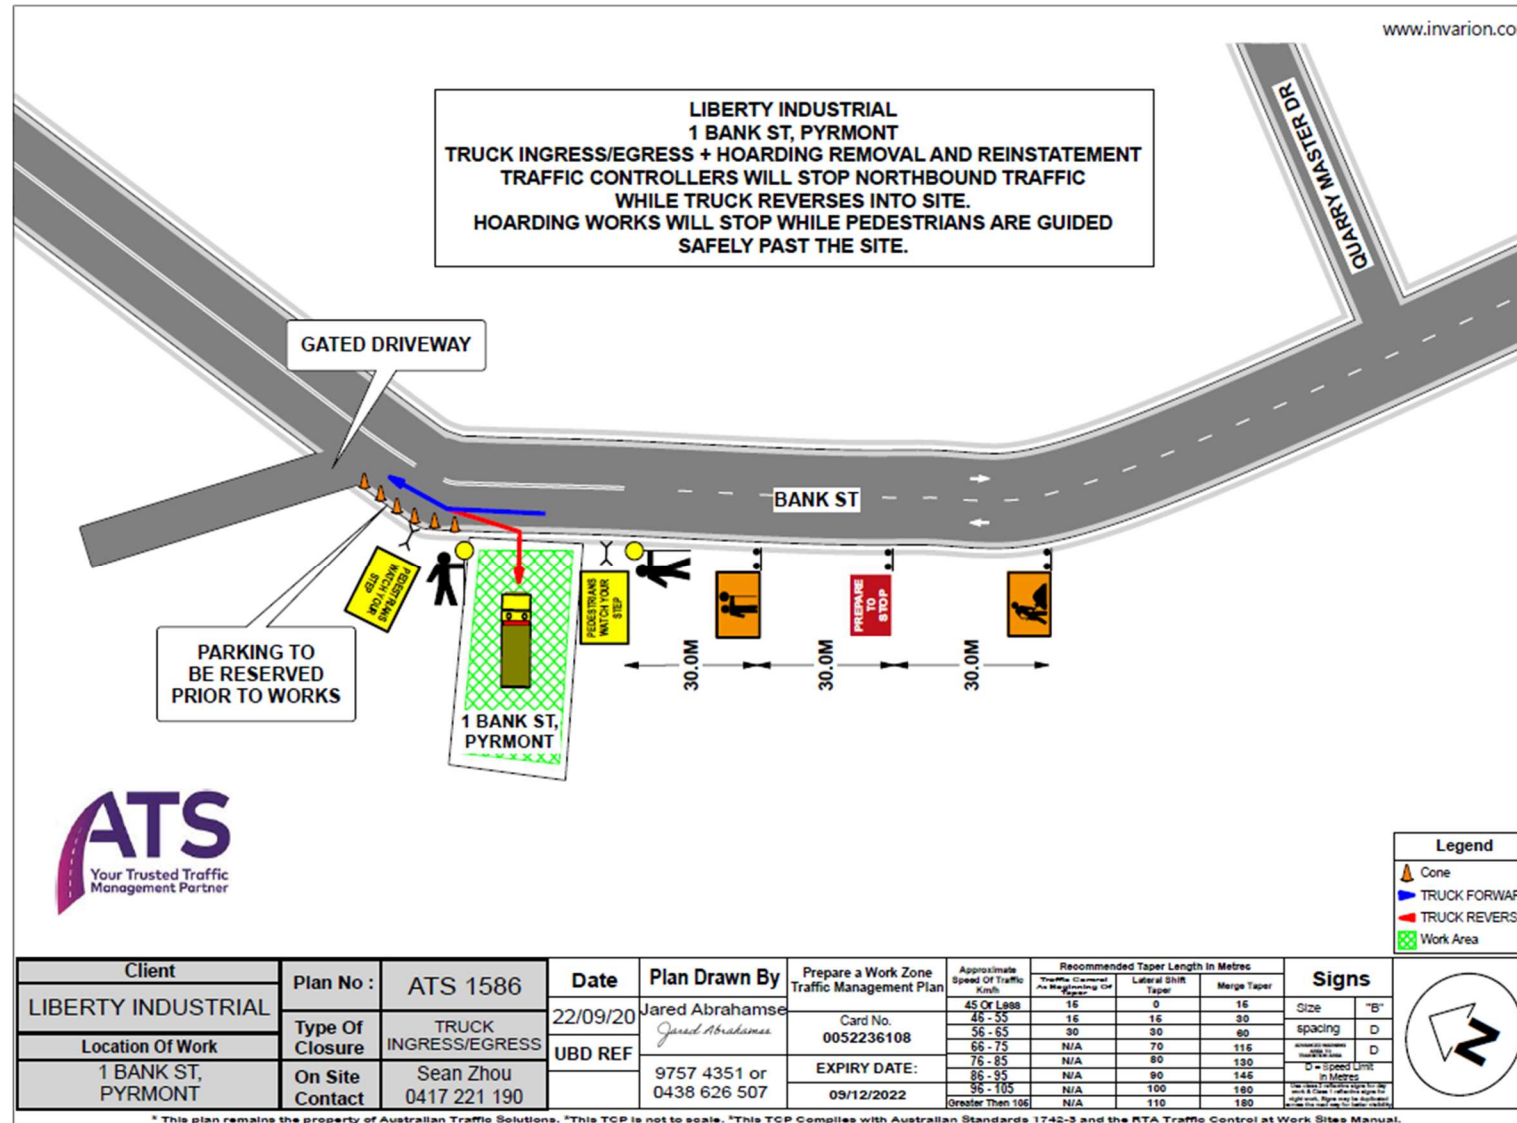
Traffic Control Plan for work undertaking at 1 Bank Street
